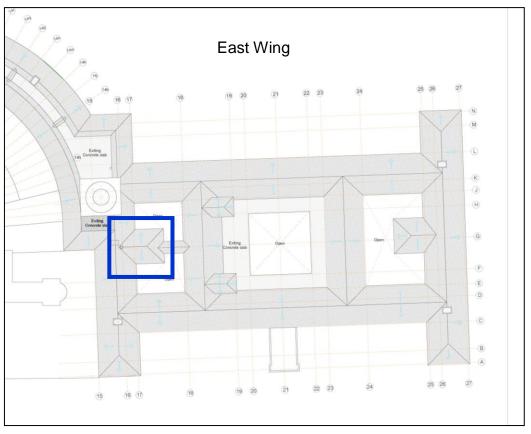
\_Union Buildings\_Overall Ground Floor Plan\_Location of Lifts in East Wing (Source: Drawing Ikemeleng Architects, 2017)
